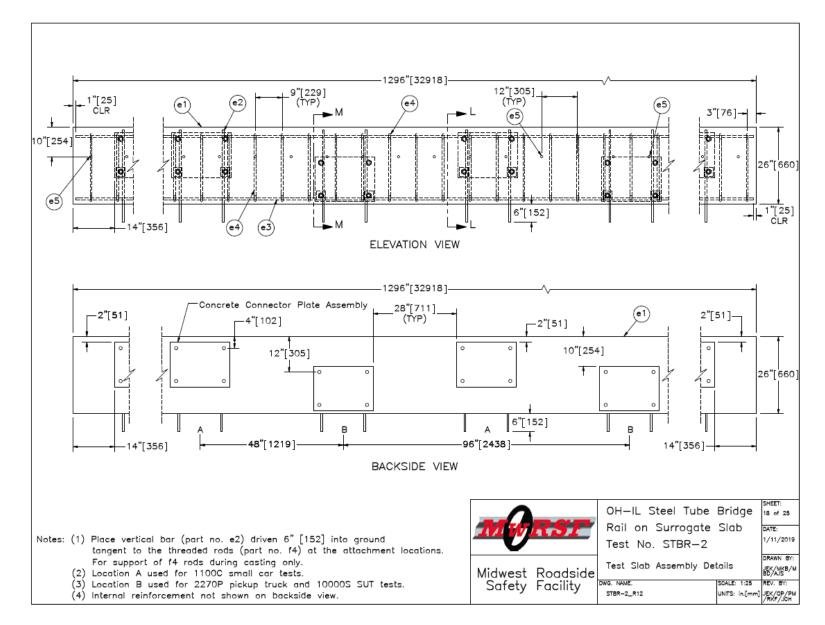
Test Slab Assembly Details, Test No. STBR-2
